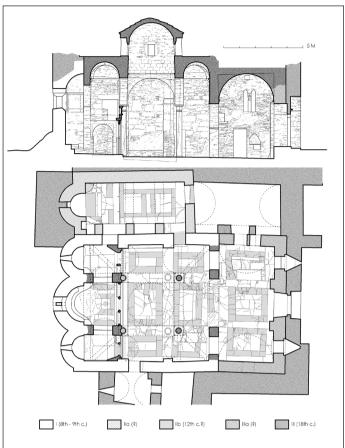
Fotodotis near Danakos. Construction phases. Plan and longitudinal section.
